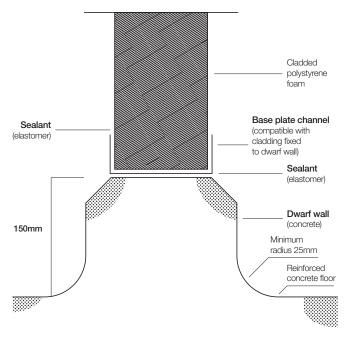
Typical dwarf wall design to support sheet walls in dairy processing areas
